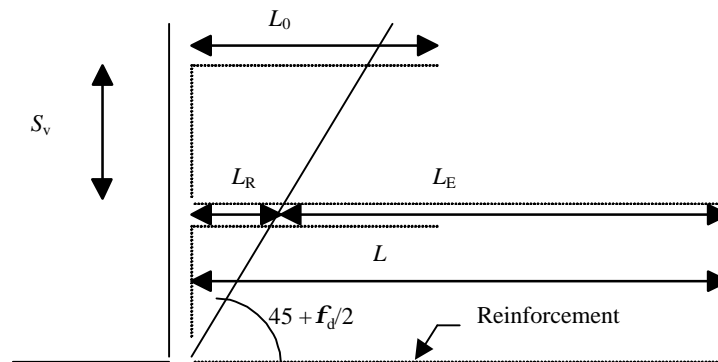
Principle of “wrap around”, where L_0 -should be min. 1.0 m.
